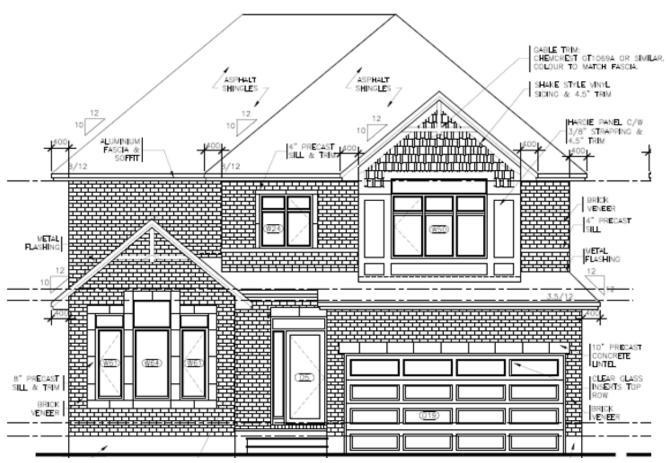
Typical front elevation drawing of a proposed dwelling unit model
